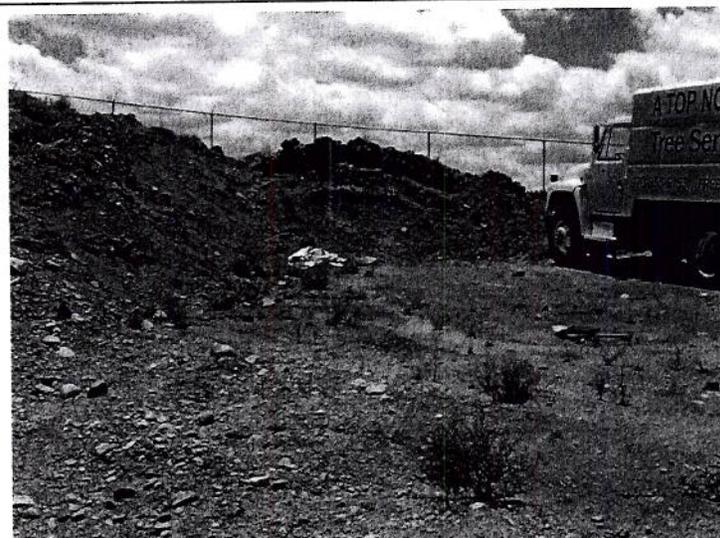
Soil stockpiles located along the southeast portion of the construction area. The stormwater drains to the north and into the retention pond.
